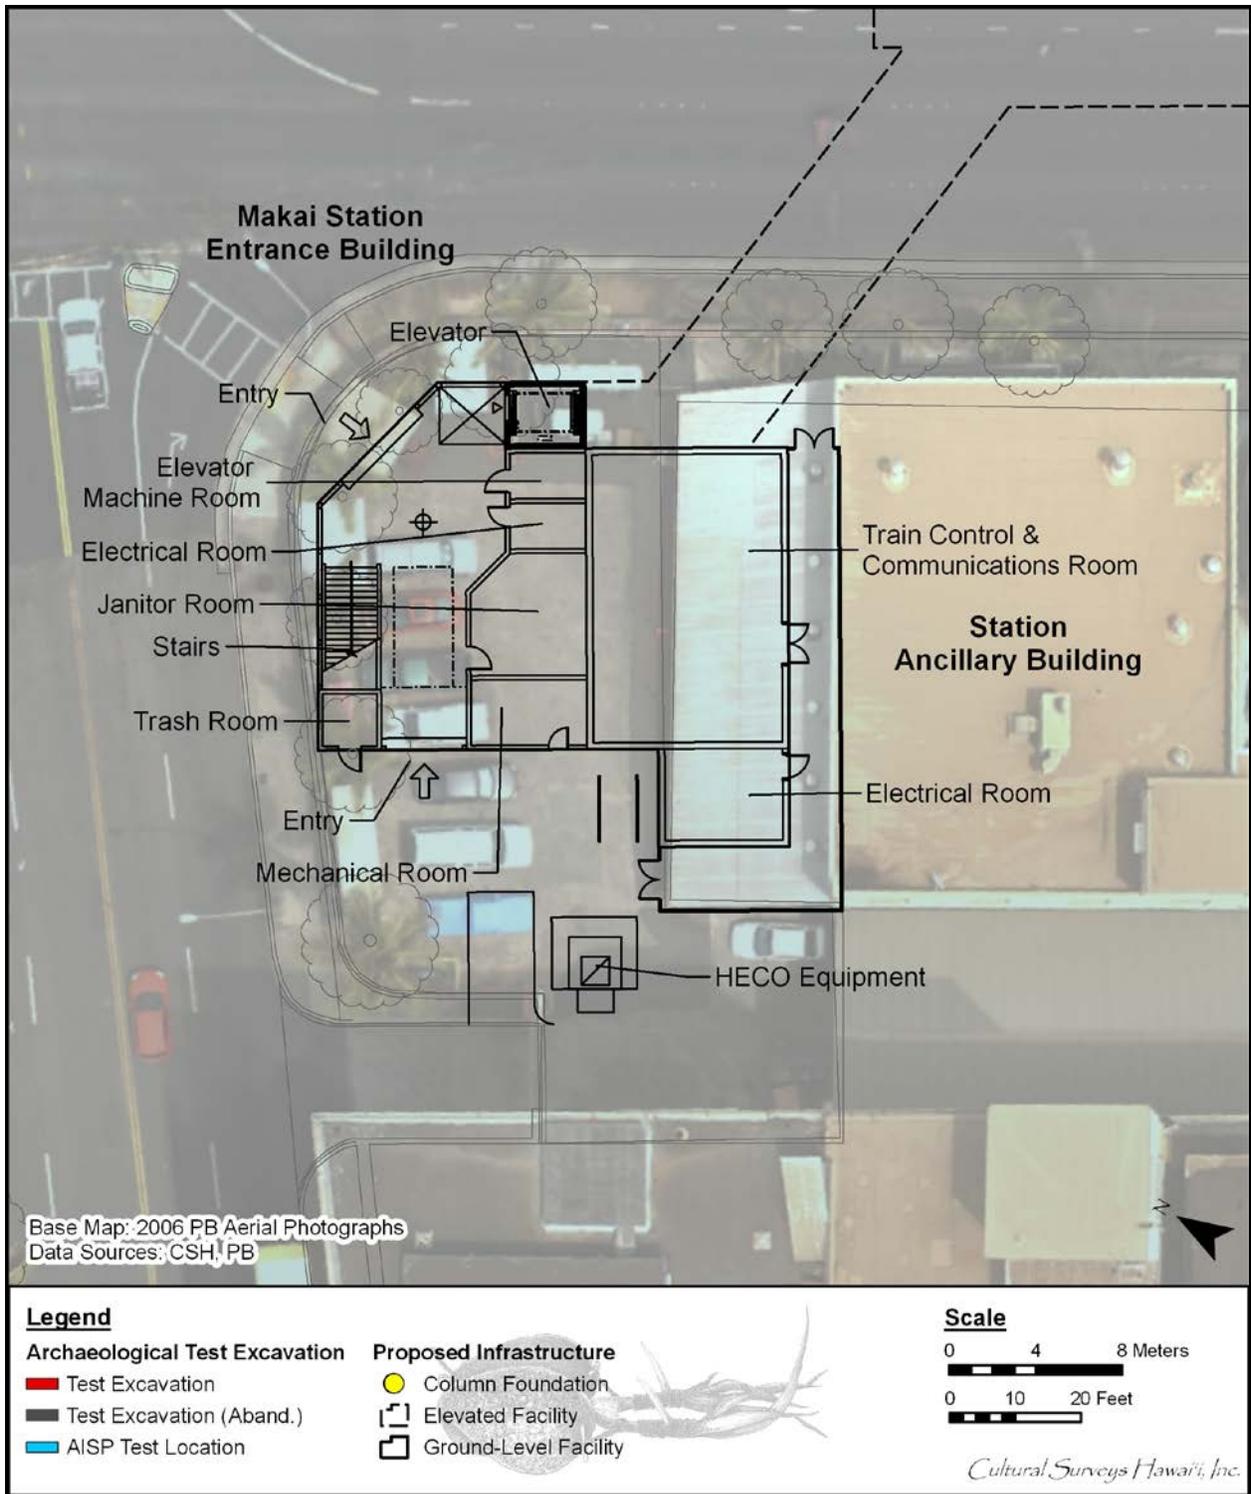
Downtown Station, detail of (*makai*) Station Entrance Building at *makai* side of Nimitz Highway showing that no testing was conducted at the (*makai*) Station Entrance Building due to its location seaward of the former shoreline and constraints
